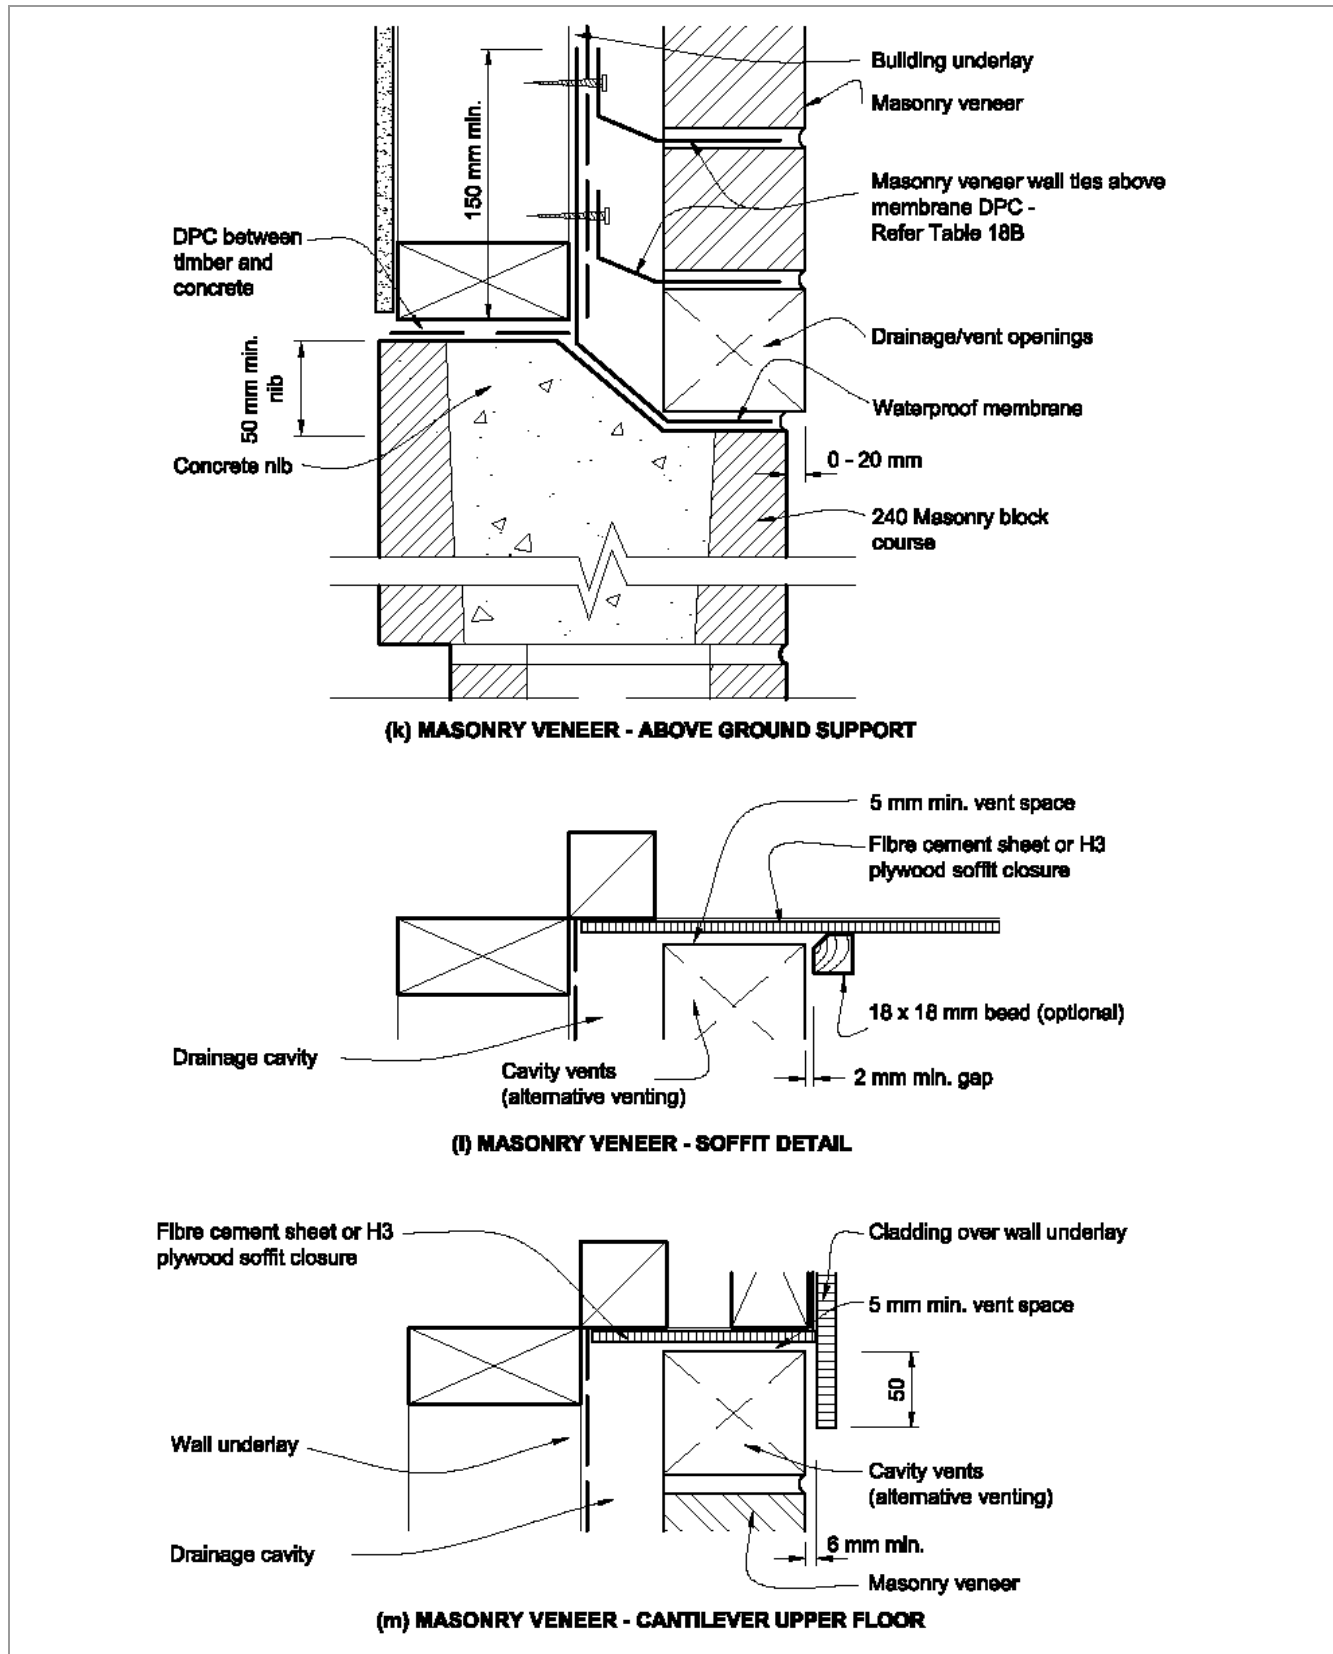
Veneer support, first floor level (Figure 73E, DBH E2 AS1 document)
